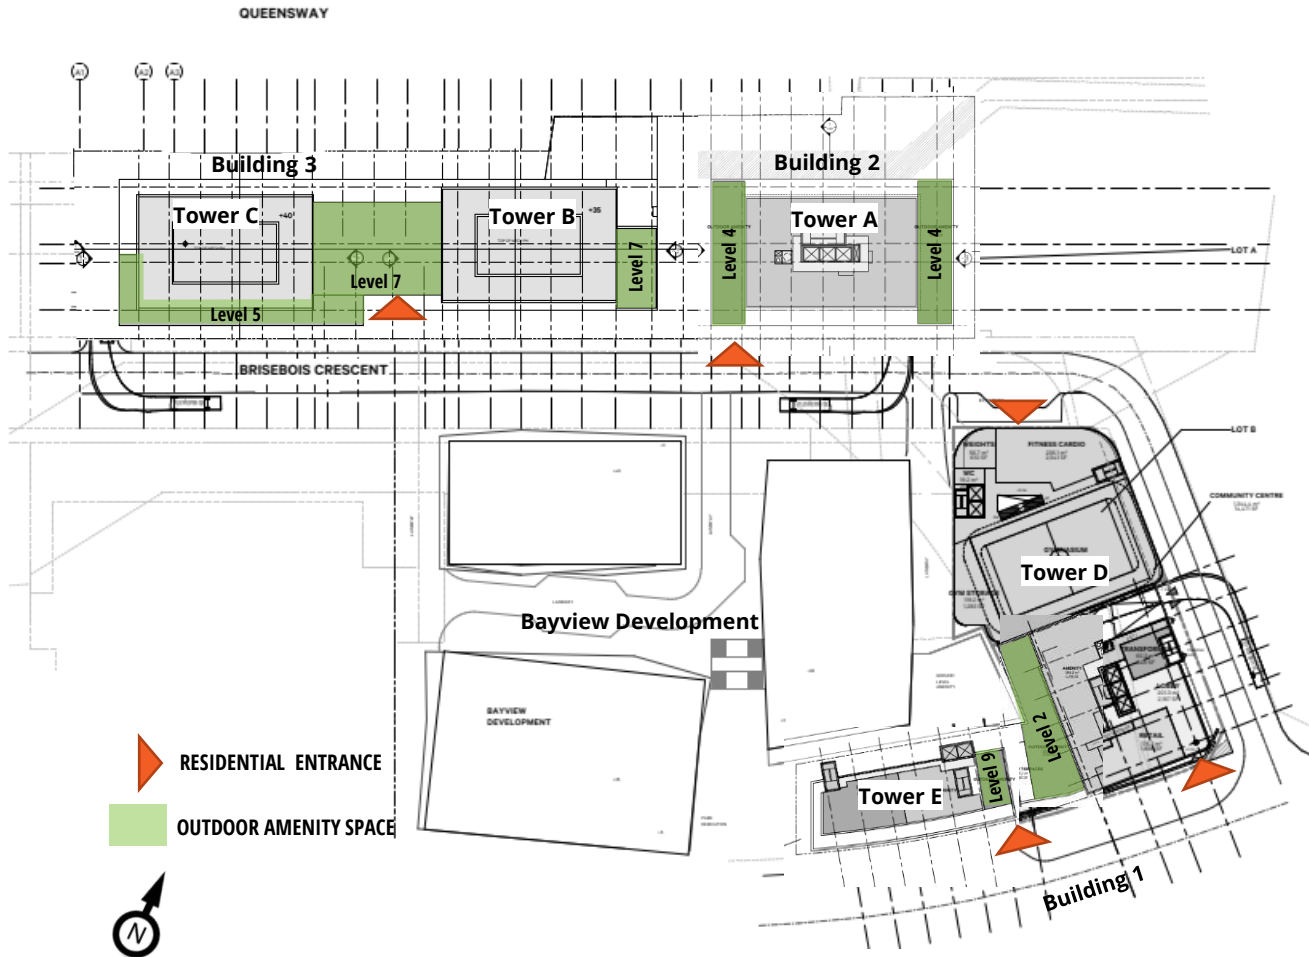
Floor Plans identifying Key Outdoor Areas of Interest
